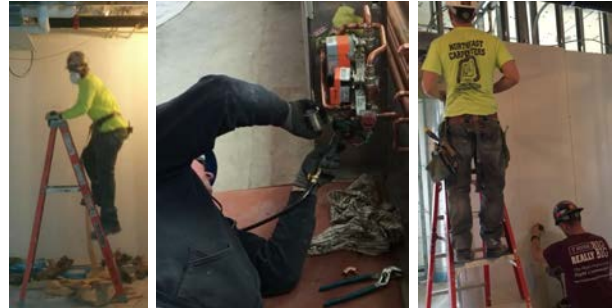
Observations from the construction site: a) Roof paneling installer climbing a ladder, b) plumber welding copper pipes, c) collaborative drywall installation.
